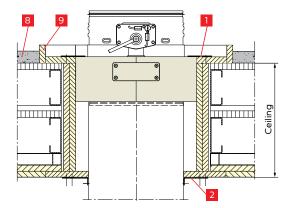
fire damper on a ceiling on the top of which a floor and a formwork (in two different designs) made of fire protection boards for installation of screed have been attached.
